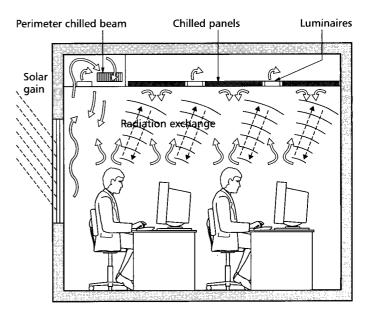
Typical ceiling layout incorporating chilled panels and chilled beams
